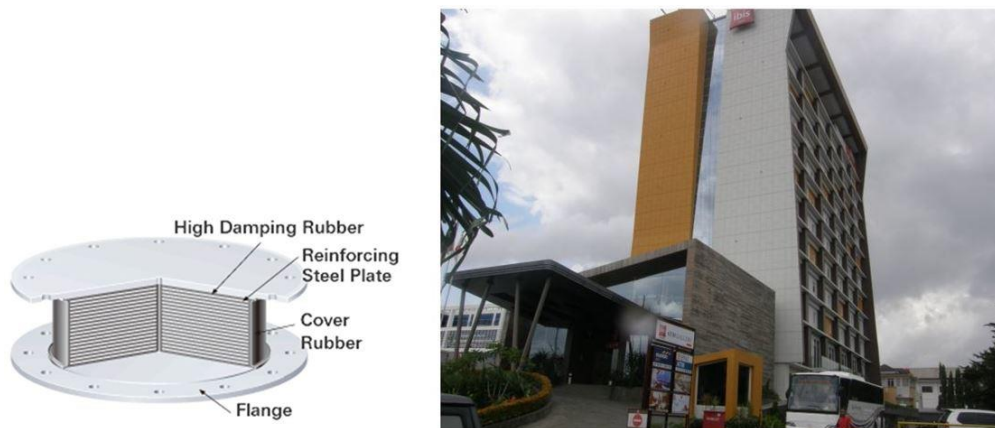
9 Detail of high-damping rubber bearings (HDRB)
